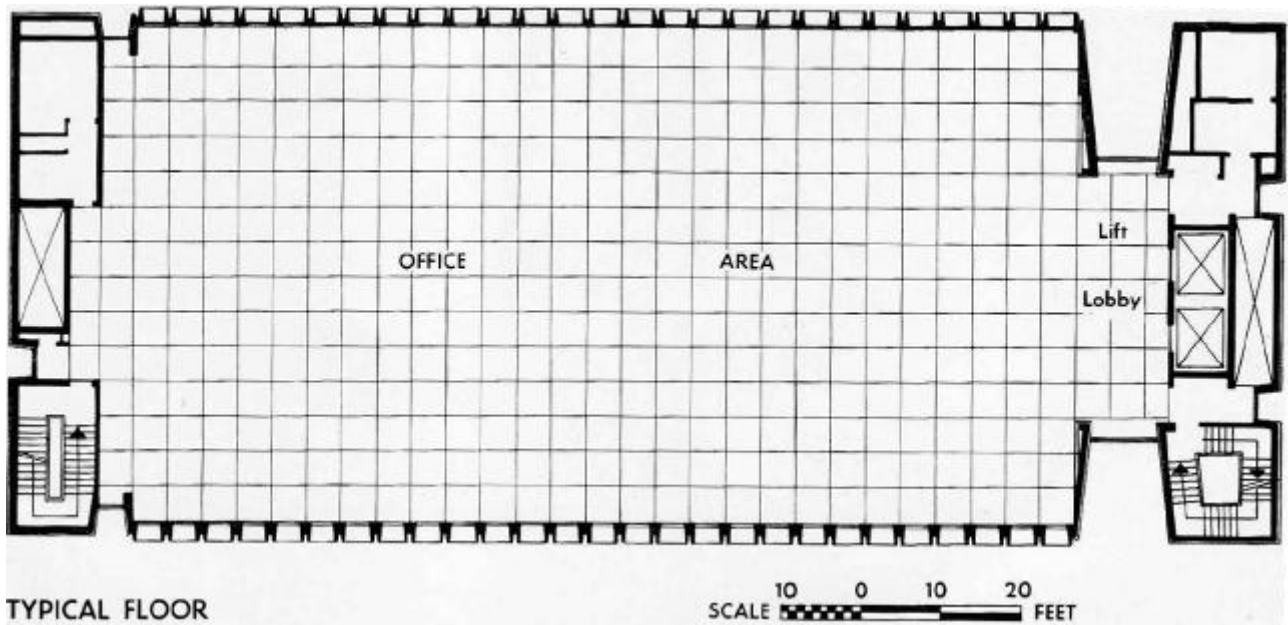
NRMA House typical floor plan (*Constructional Review* 1971)
